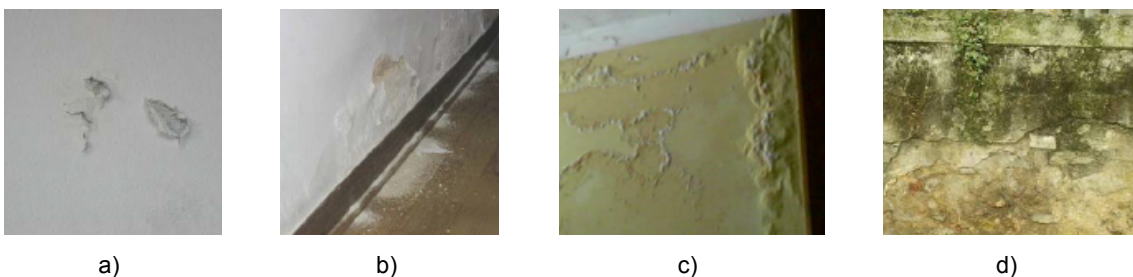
Coating degradation (Branco *et al.*, 2011): a) Paint peeling due to water infiltration; b) Plaster peeling due to raising water (capillarity); c) Efflorescence and cryptoflorescence; d) Parasite vegetation.
